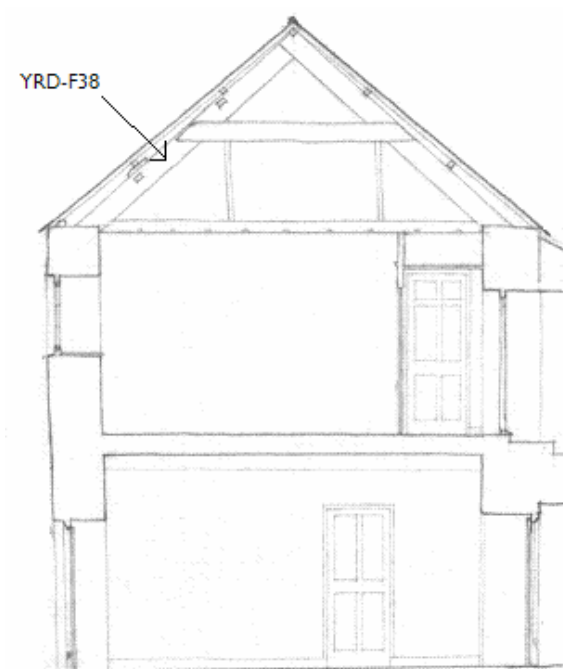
South-facing section through the North-South range, showing truss 2 and the location of sample YRD-F38 (Architecton, section position shown on Fig 16)
